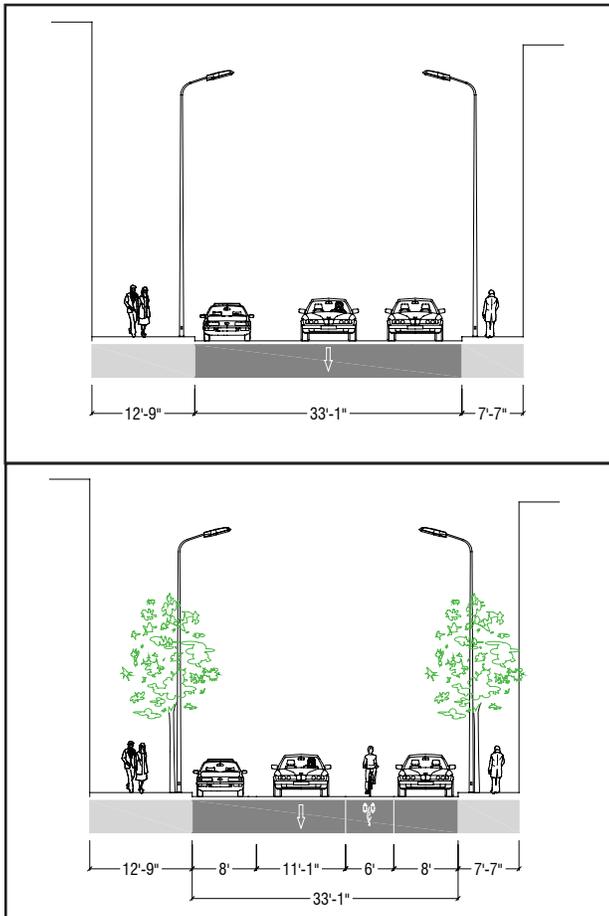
Section 1: Gerard Avenue existing and recommended cross section (facing south)
